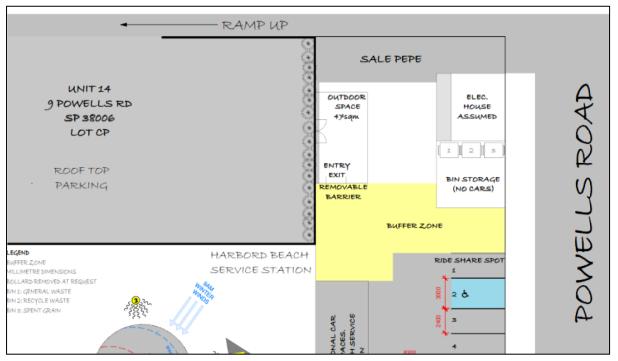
Partial Site Plan of subject tenancy and adjoining Brewery (source: Demont Design)
